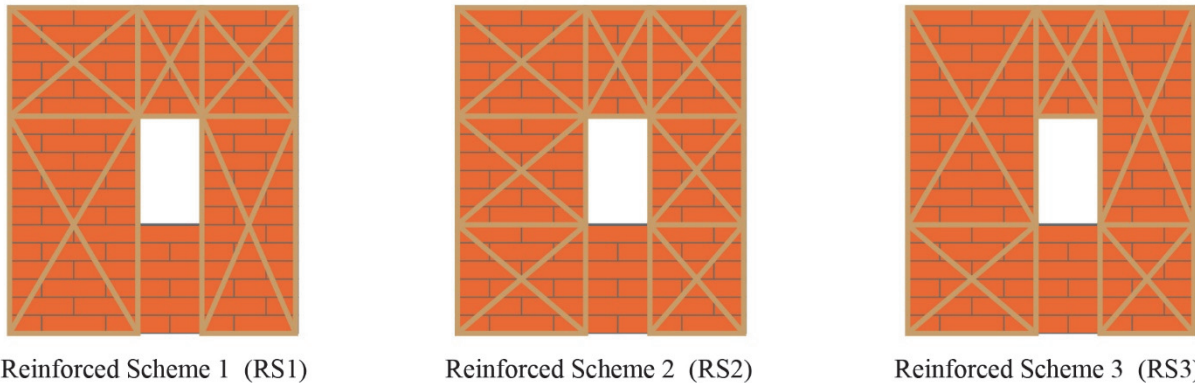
A masonry wall with an opening: Comparison in terms of geometrical arrangement of timber frame retrofit system.
